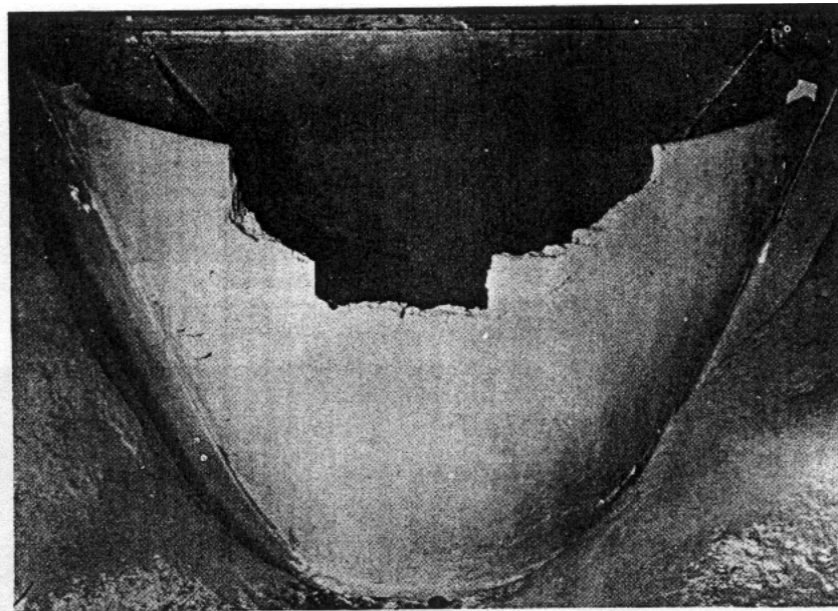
Final failure of Futatsuno Arch Dam model.
